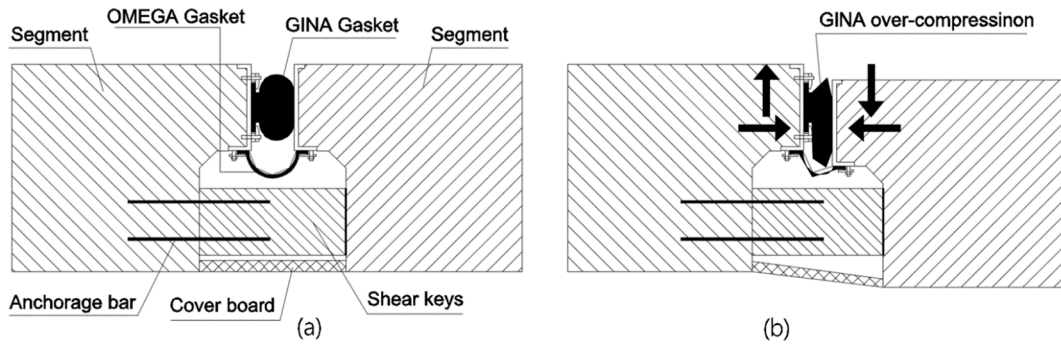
Immersion joint deformation at tunnel roof: (a) Schematic of a typical immersion joint and (b) deformed joint.
